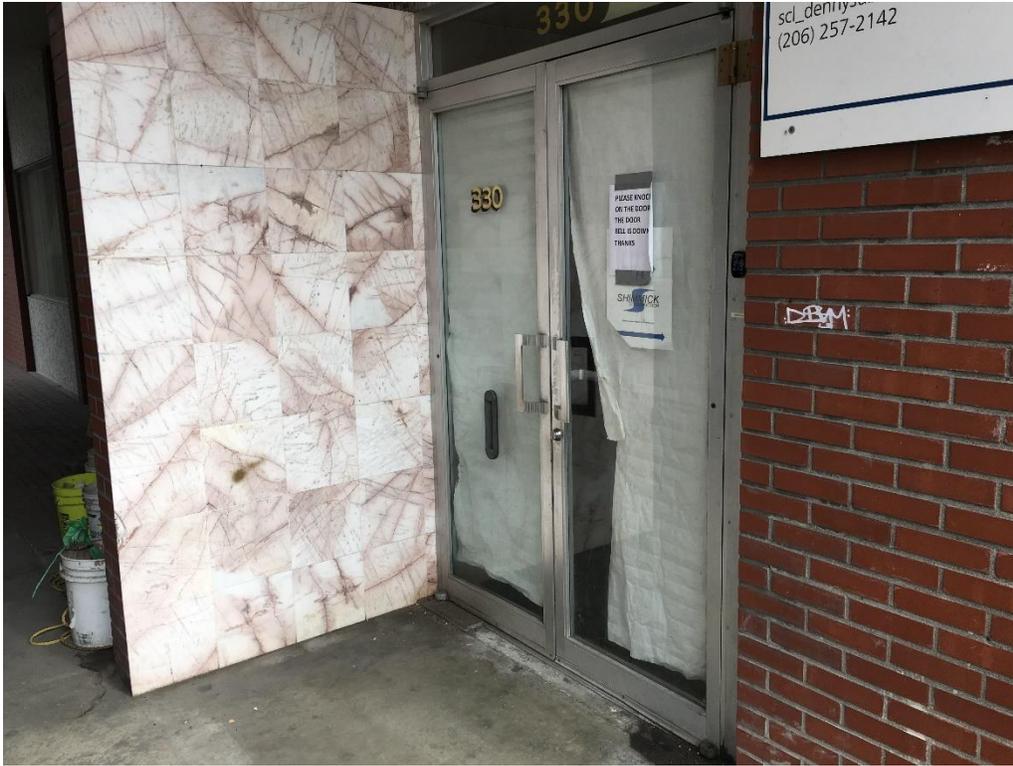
EAST ELEVATION - DETAIL (2018)
